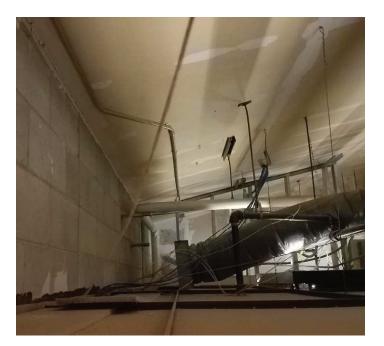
&3 – East entry upper level.IR shows some thermal leakage where the concrete meets exterior wall.
